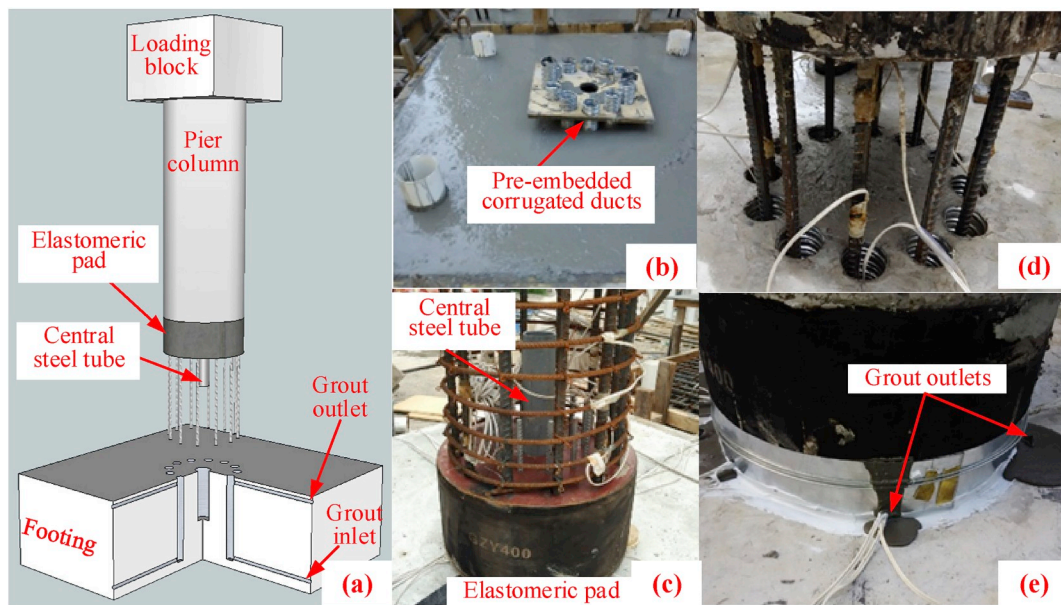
Construction procedure of GCP-M specimen, (1) schematic diagram, (b) precast footing with embedded corrugated metal ducts, (c) longitudinal rebars inserting to corrugated metal ducts, (d) reinforcement cage of the bridge column with a built-in elastomeric pad, (e) grouting joint gap.
